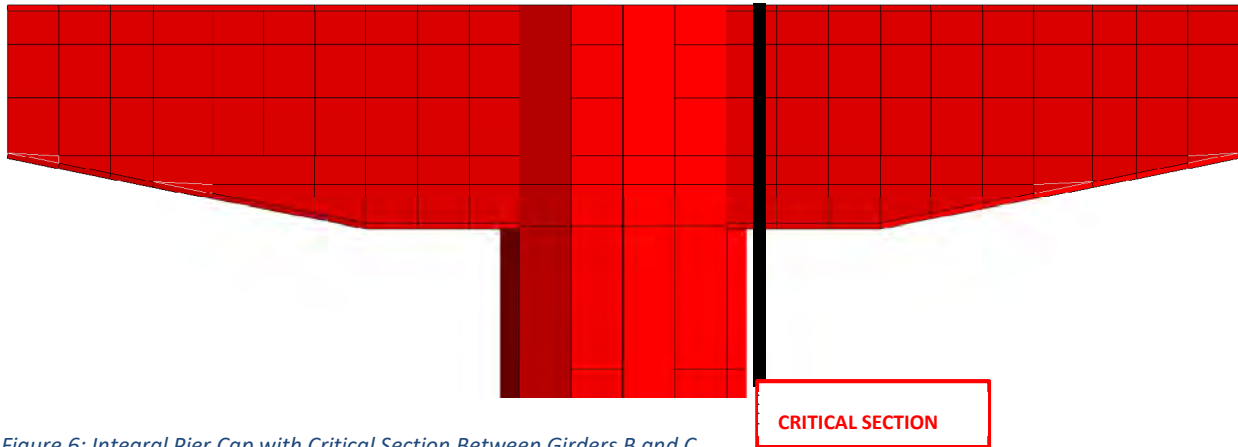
Integral Pier Cap with Critical Section Between Girders B and C
